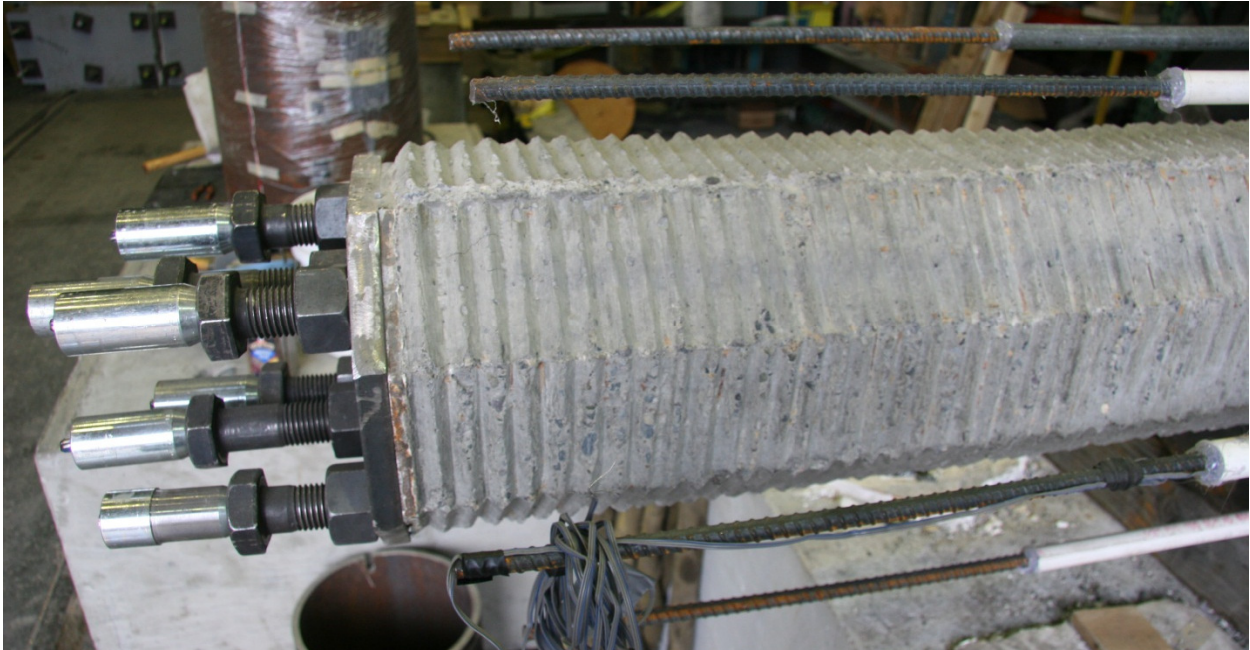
Steel bearing plate, STD's, and strand chuck anchorage assembly on end of reduced diameter section.
